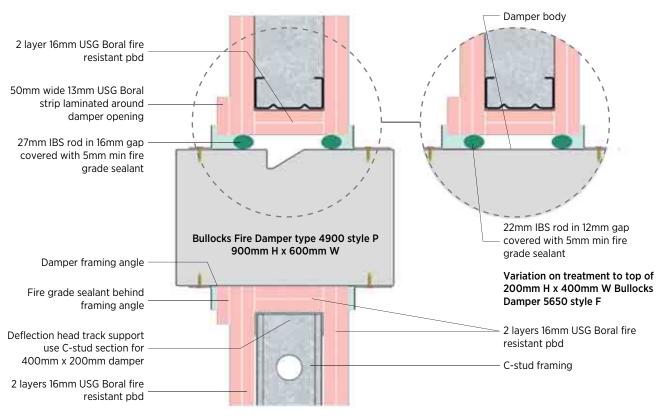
Typical Fire Damper Detail - FRL 120/120/120 Steel Stud Wall
